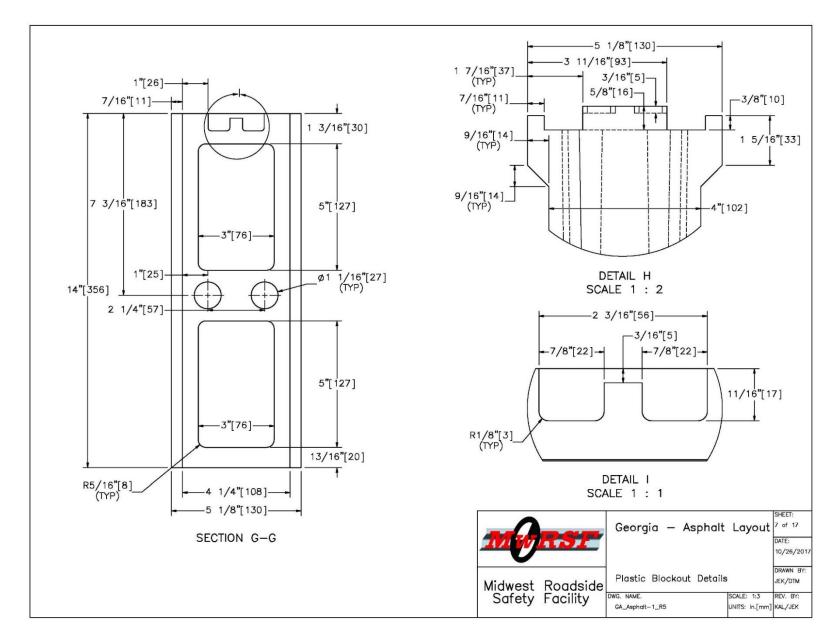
Additional Plastic Blockout Details, Test No. GAA-1
